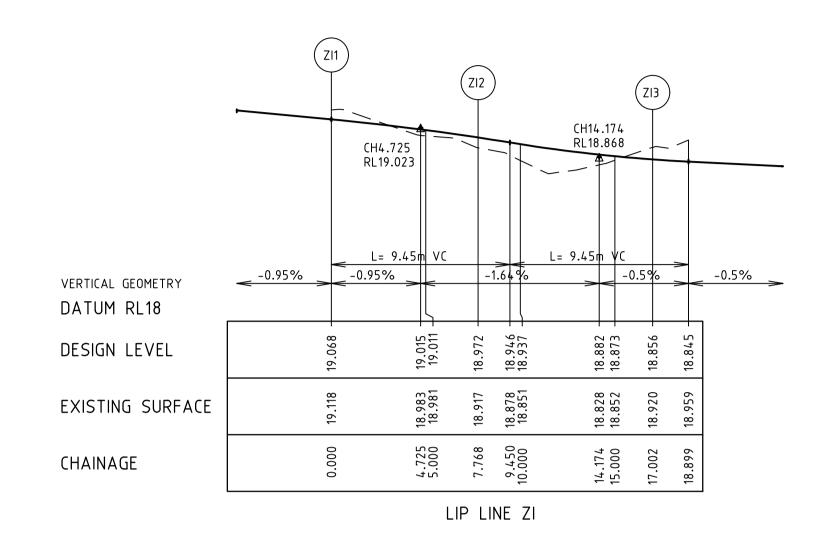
E-16-06 Sheet No. 6 of 33
